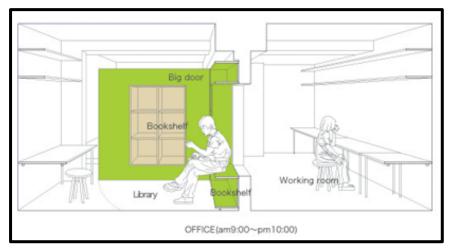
Tokyo apartment by installing two mobile walls (Etherington, 2010)
